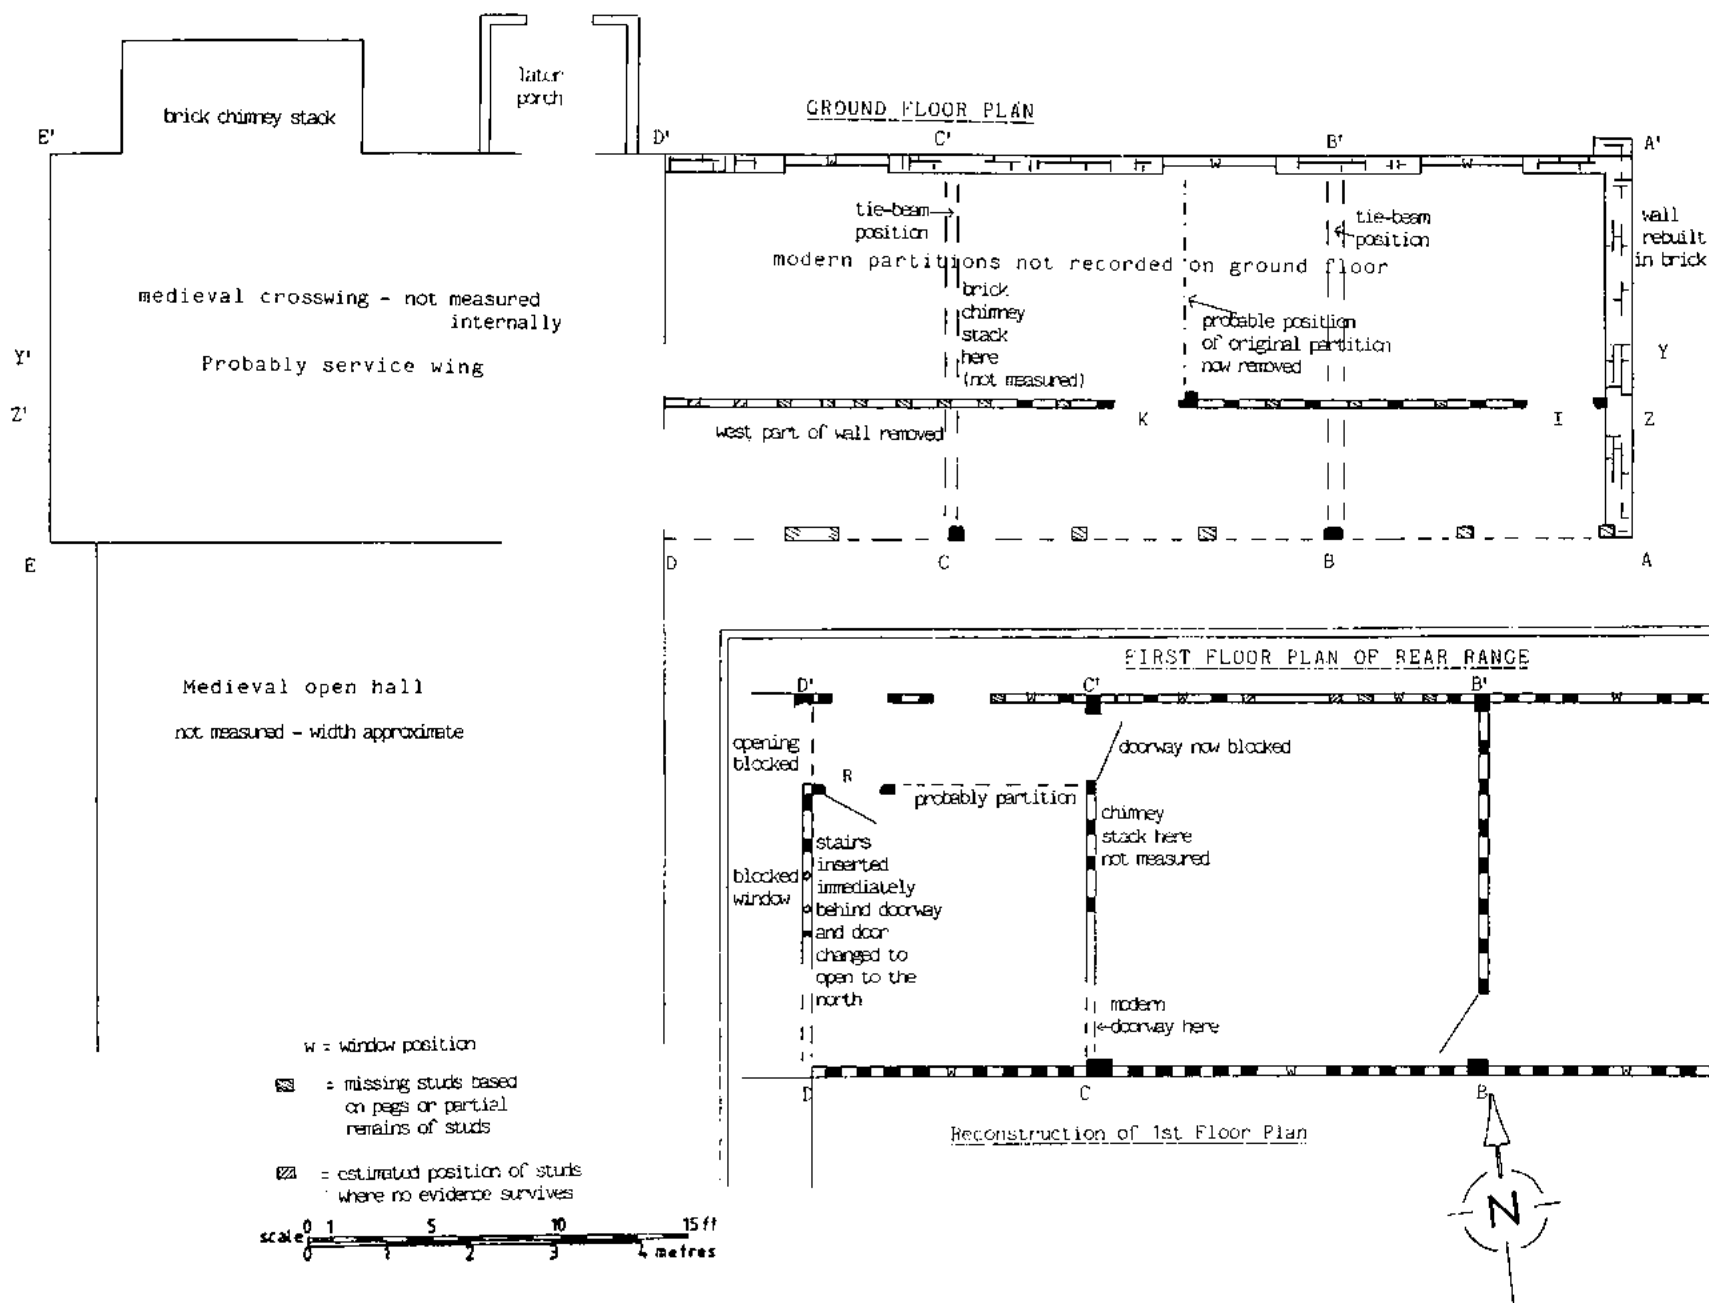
Plan of Newland Hall, Roxwell, Essex.
